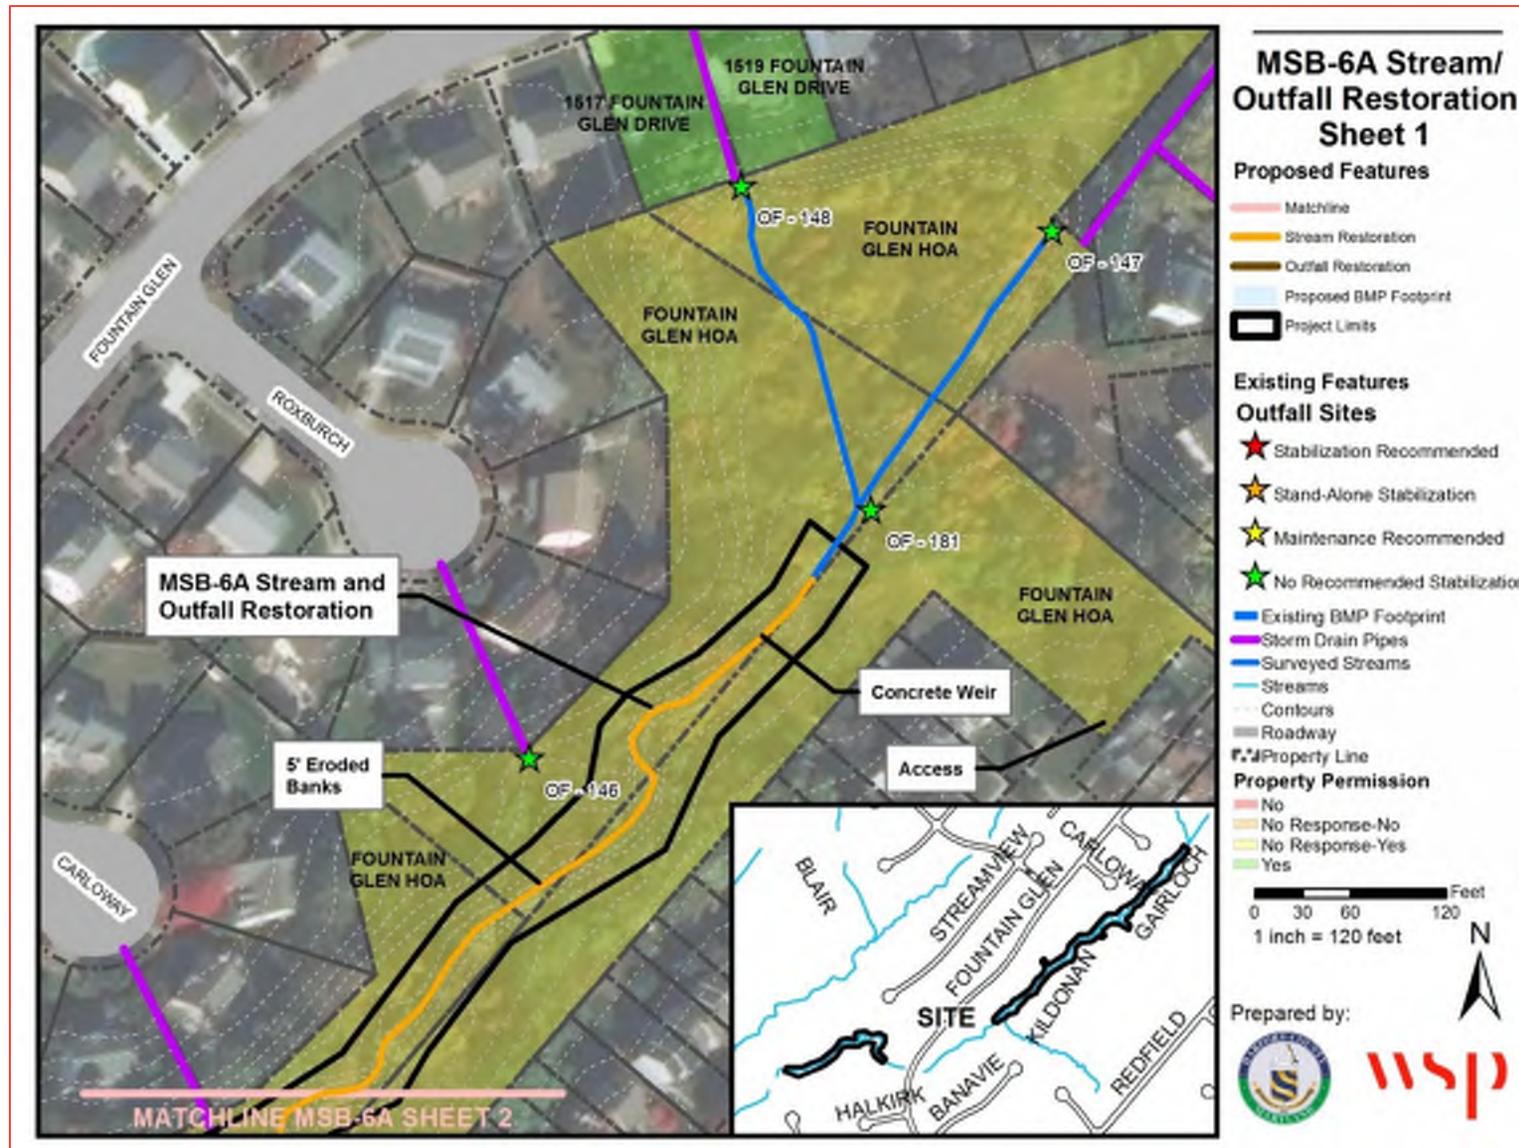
Site Location and Proposed Project Plan for MSB-6A Stream Restoration (Sheet 1 of 4)
